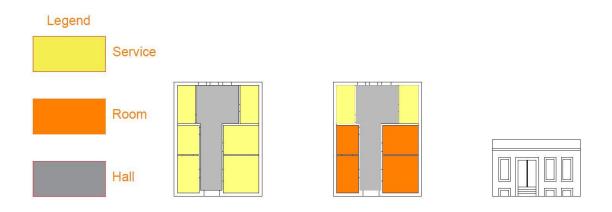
The base sample of the single-story İzmir Houses in with plan type 1
